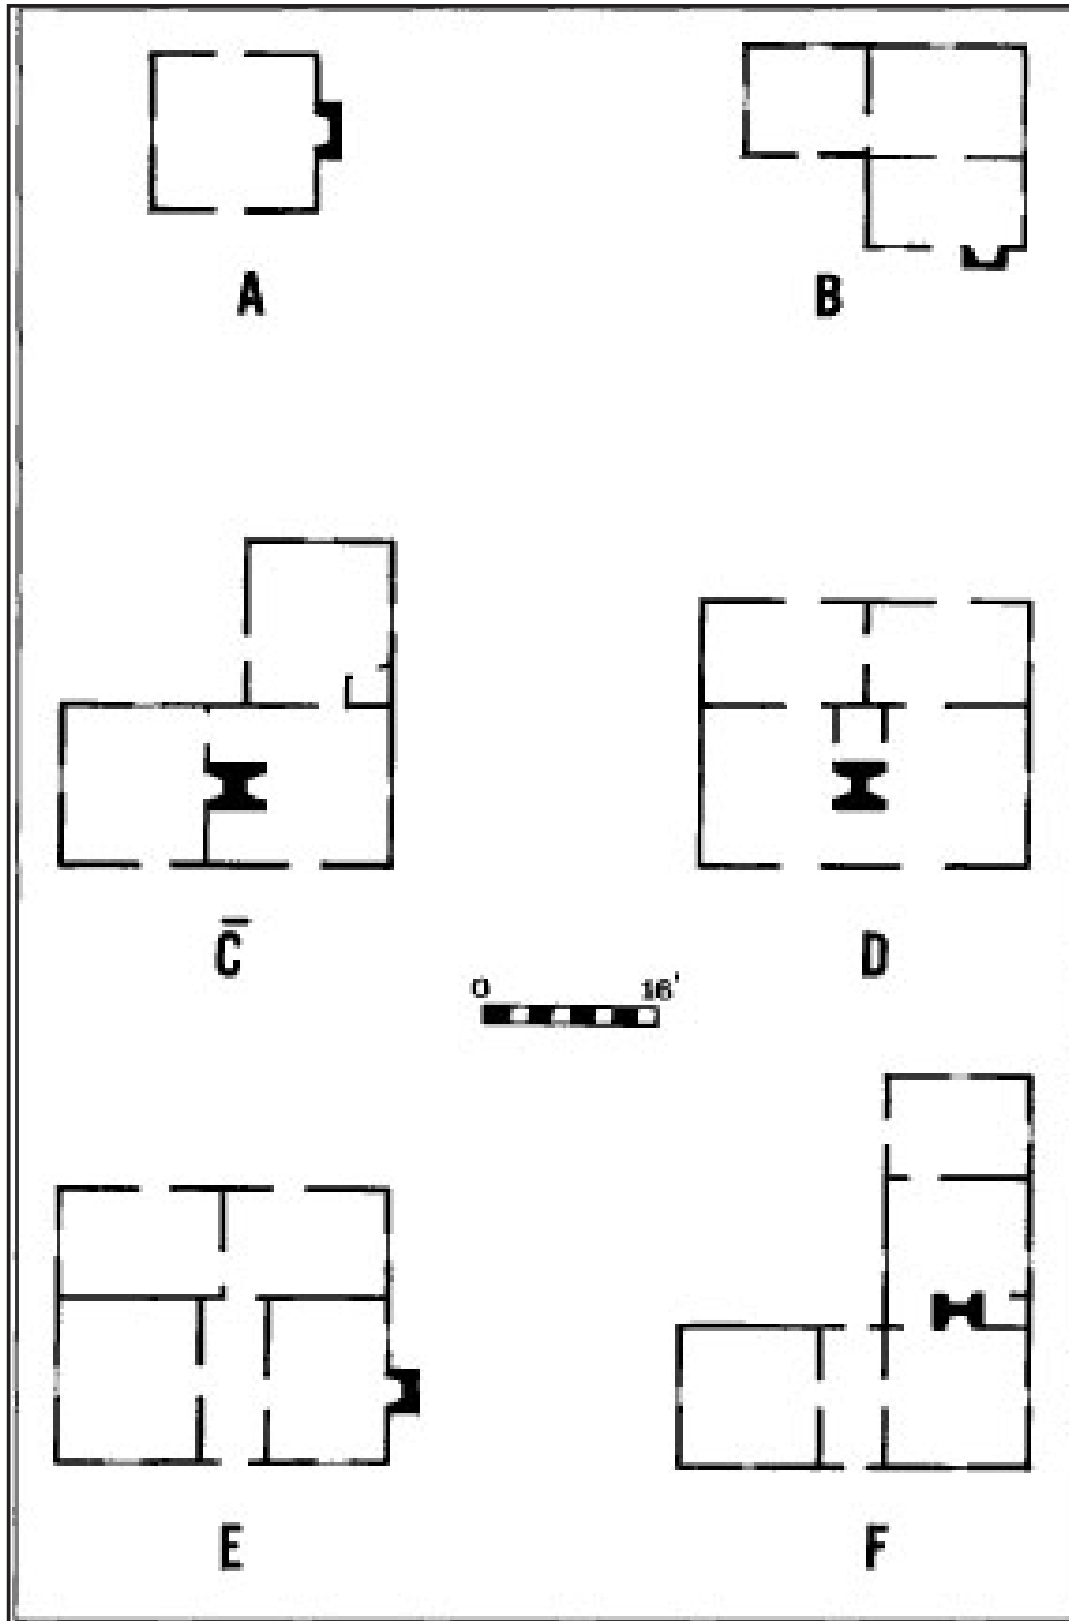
Examples of sharecropper floor plans taken from Reinberger 2003.
